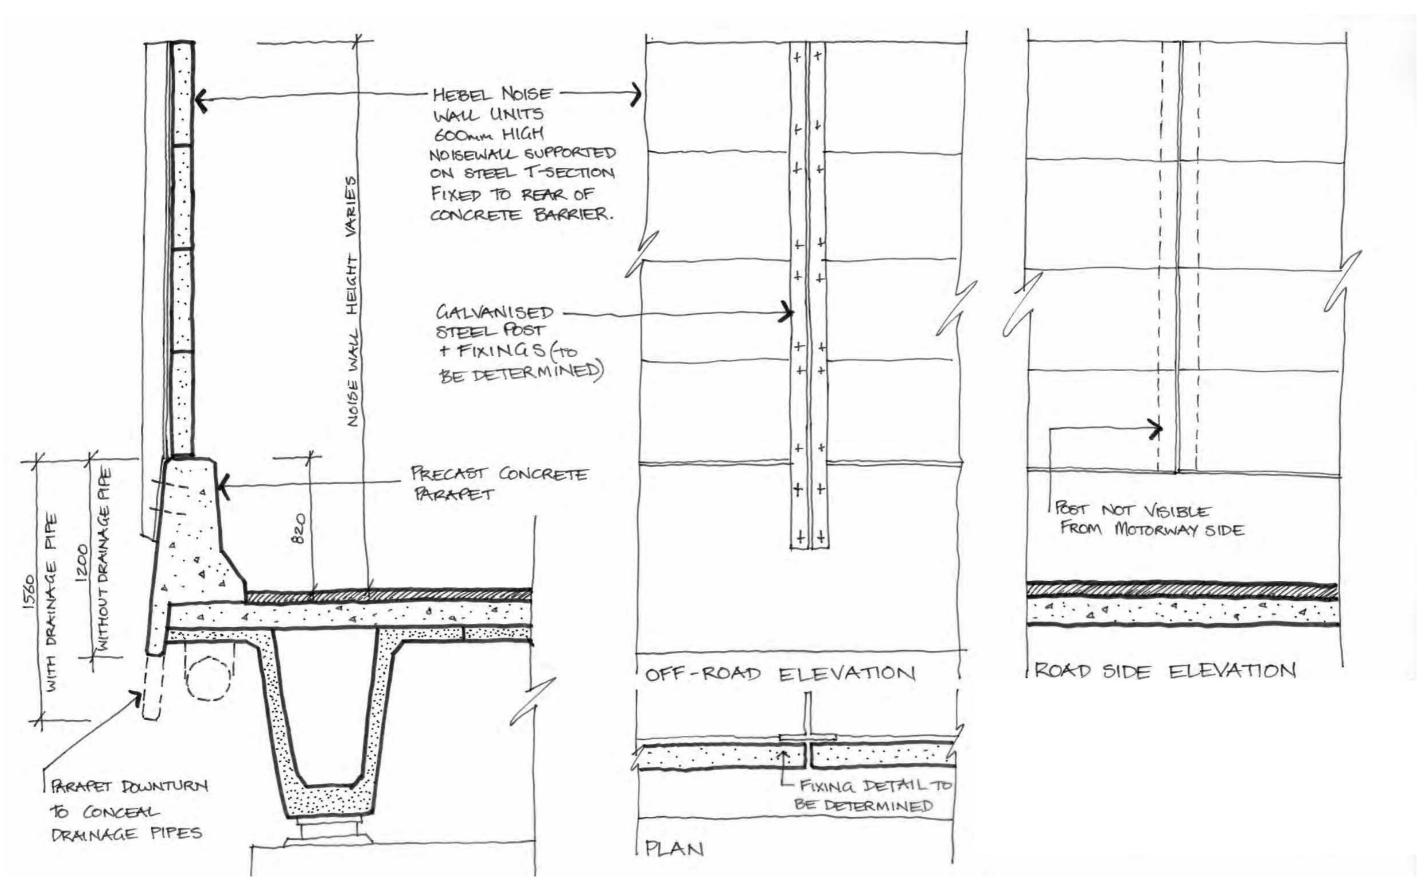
Typical Bridge Parapet Detail as used on Darling Mills Creek Road, Yale Close Bridge and Devlins Creek Bridge
